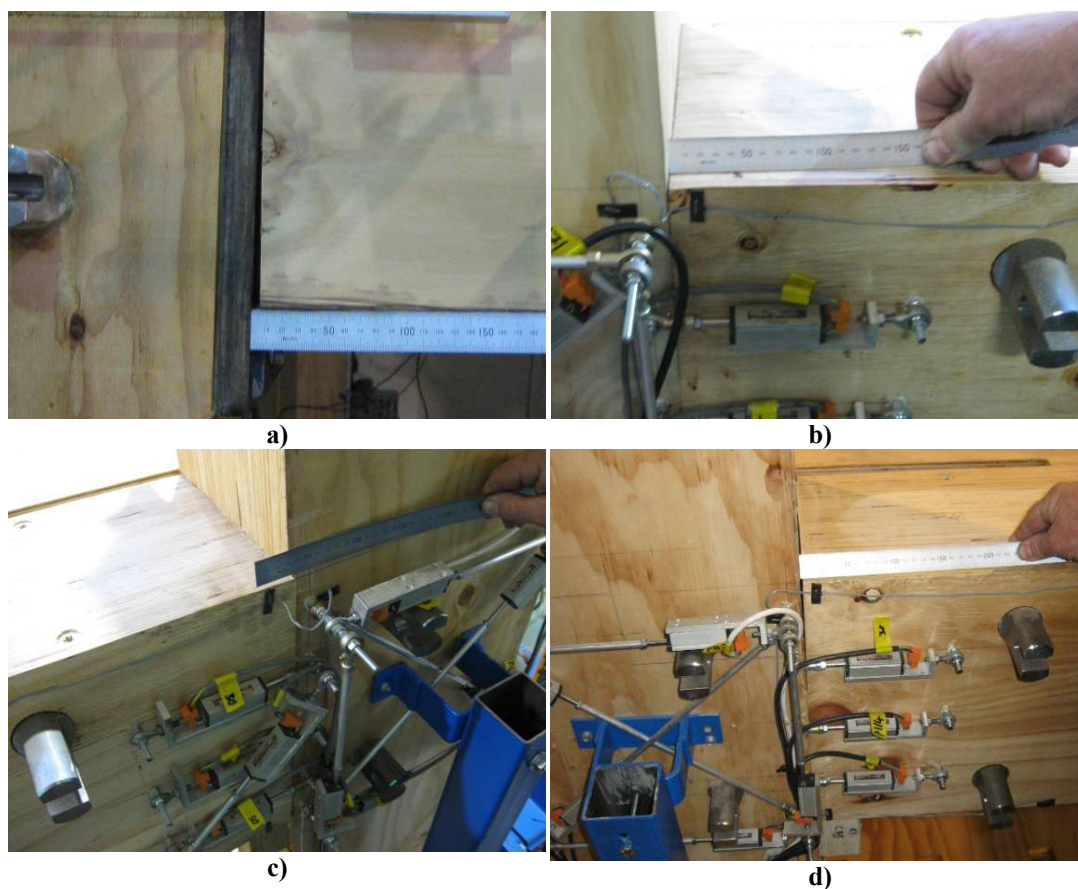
BC connection gap opening at 2% Drift a) SW column L2 b) NE column L3 c) NW column L3 d) N column
